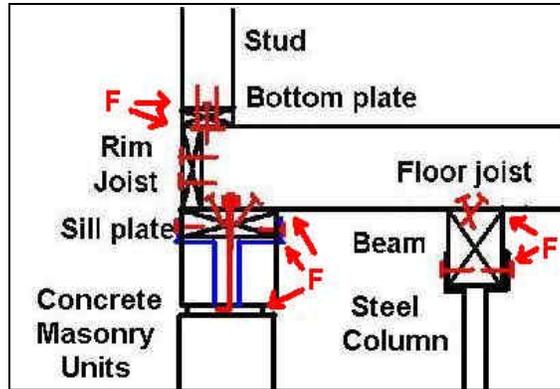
Typical cross section of a masonry wall foundation showing nailed and bolted connections (in red) and strapped connections (in blue). Center beam is wood or steel. Failure of this foundation type frequently occurs at areas denoted by the letter "F".
